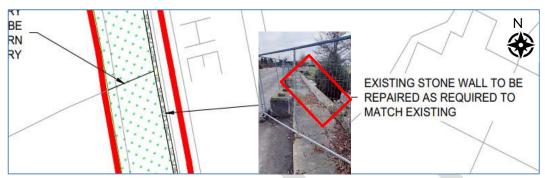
Existing Stone Wall and Footpath provision and Proposed Works
